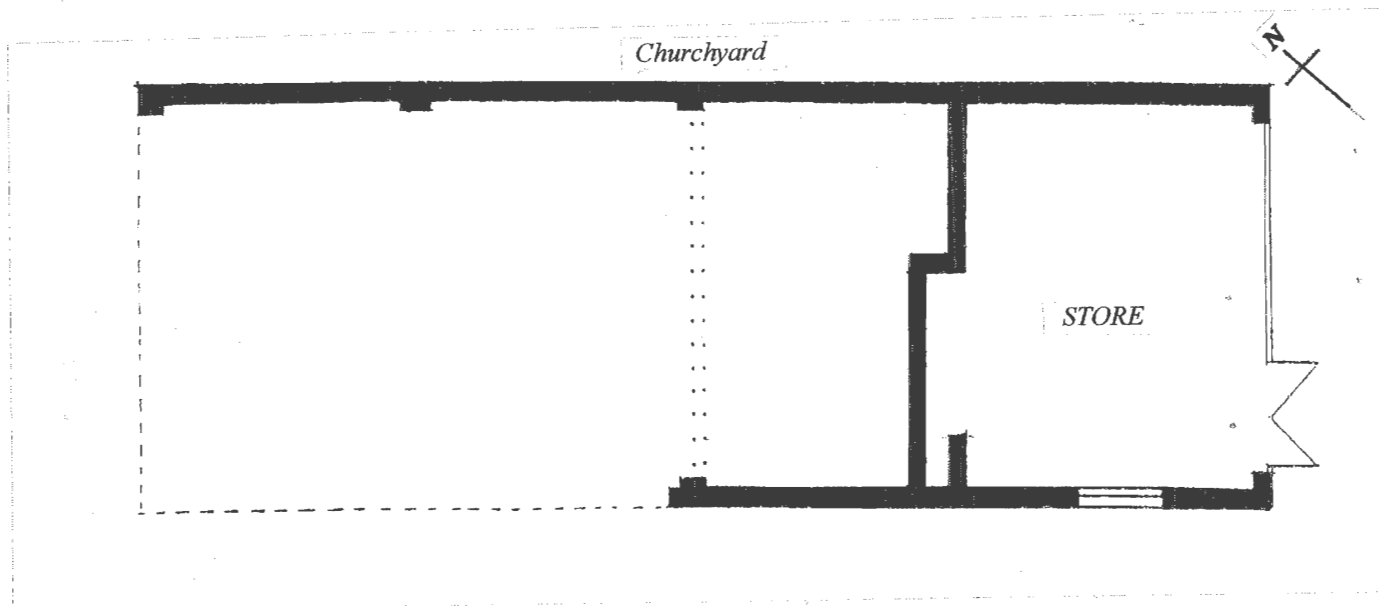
Existing Outbuilding Plan (Scale 1 : 100)
